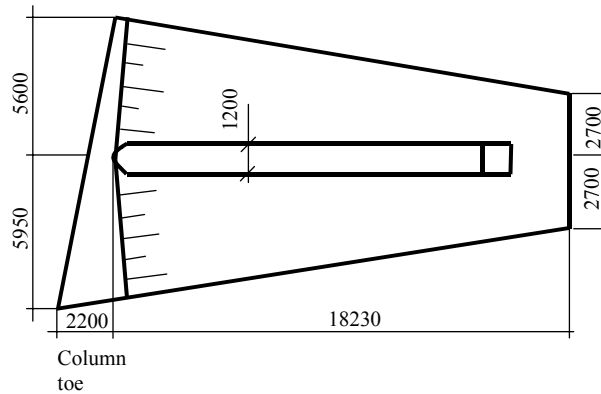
Geometry of bottom slab (dimensions in mm).
